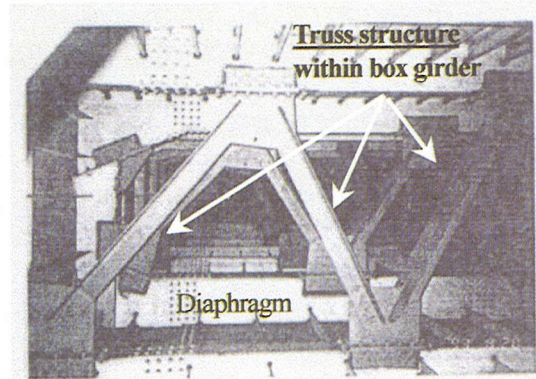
Example of "Repair H" performed by truss structure within the box girder bridge.
